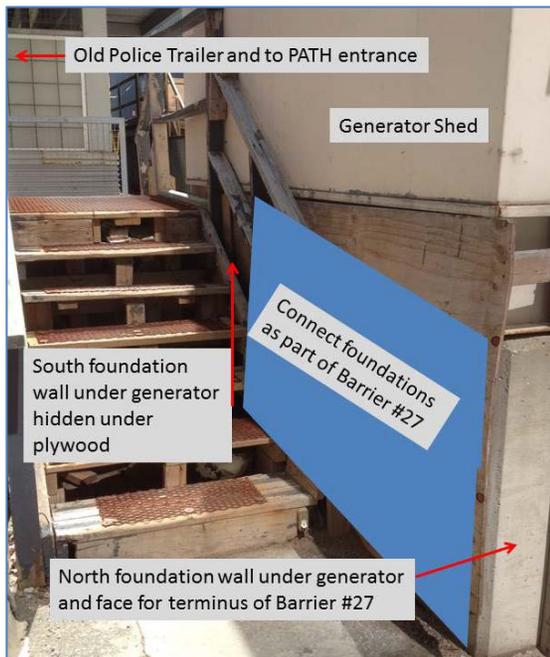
(left): Detail of custom barrier to be placed under stairs between foundation walls under Generator Trailer on the North Temporary Access site.
